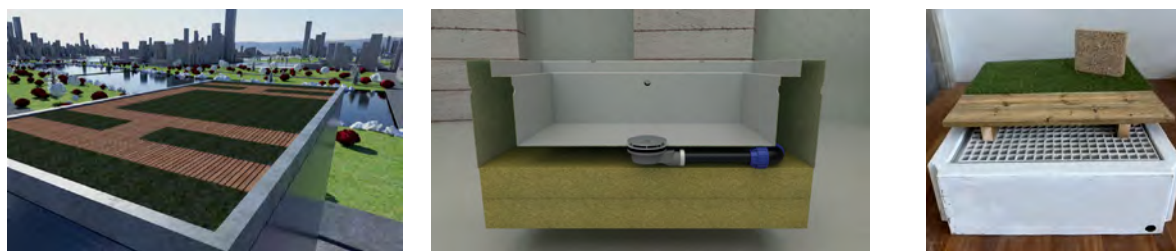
ADAPTIVE: Retrofit of a building roofing with a gardened leisure space using the lightweight composite
